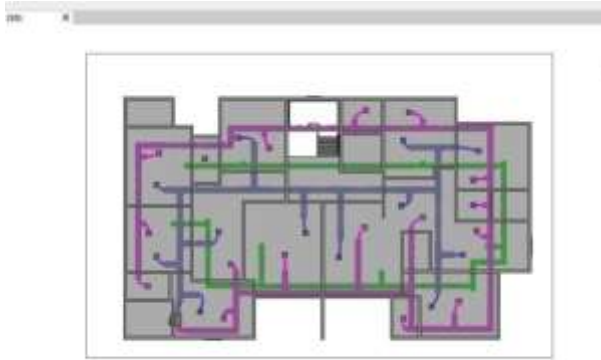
Actual Revit Plumbing layout of floor plan where pink – drainage/ hot water, green – cold supply)
